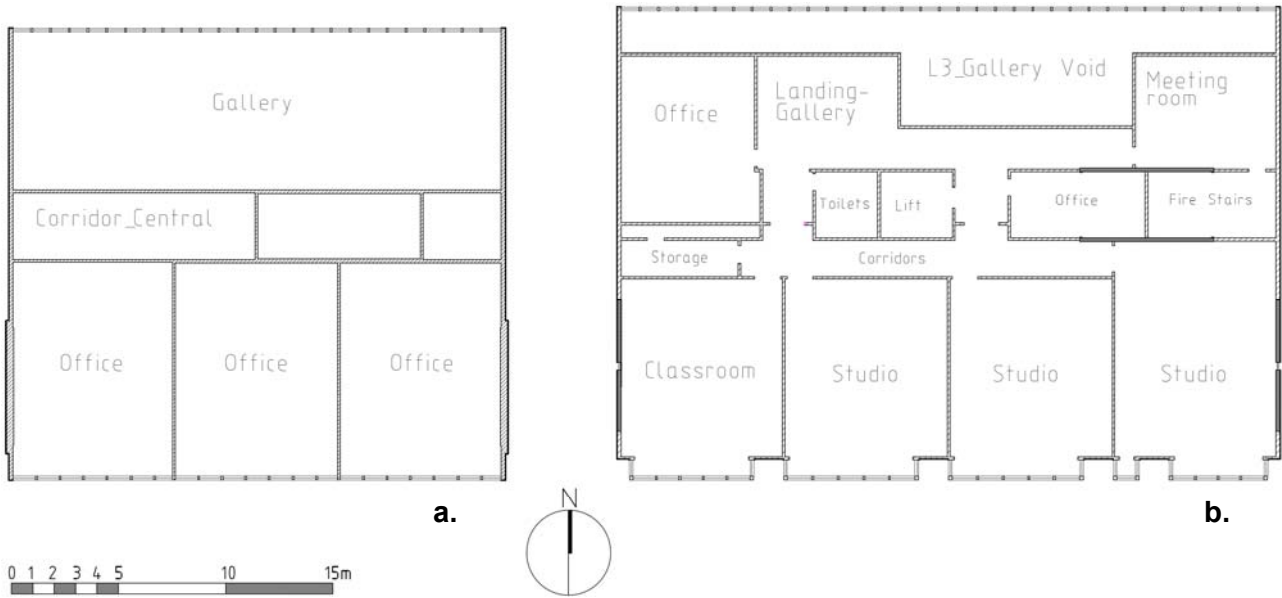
Comparison of the plan section on Level 1 of the test building (a) and the Arts building (b).
